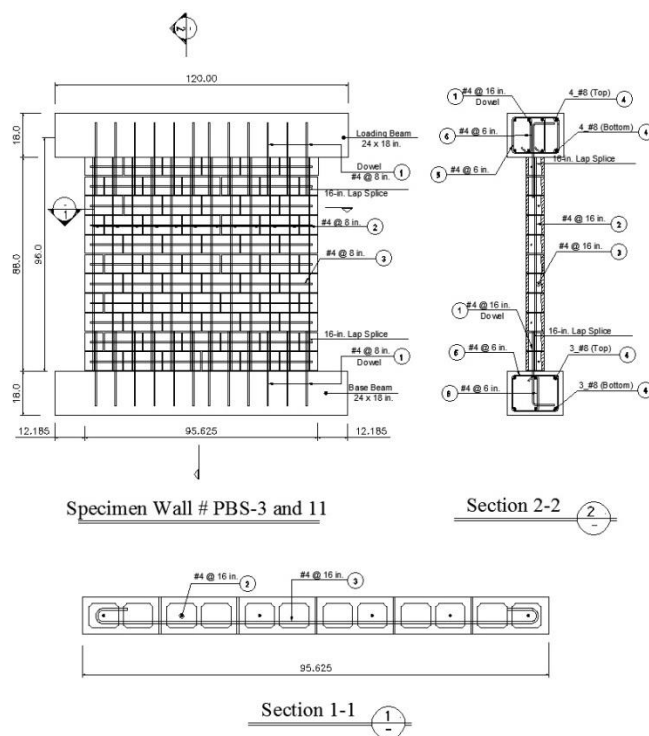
Reinforced masonry wall UT-PBS-03 tested by Ahmadi (2012)
